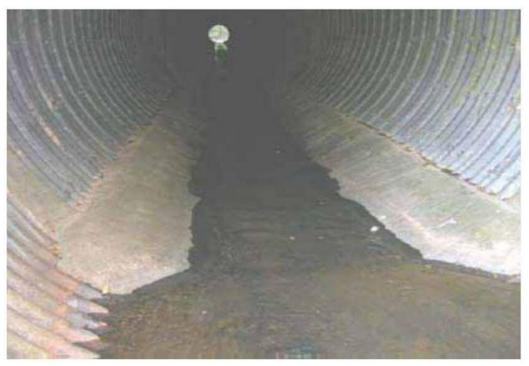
Paved Invert in CSP (FHWA, 2010)
